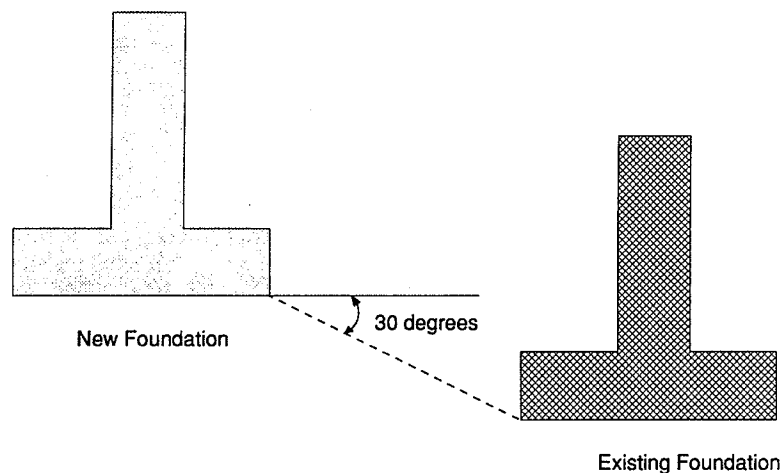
Recommended Location of a New Foundation on Firm soil or Rock
